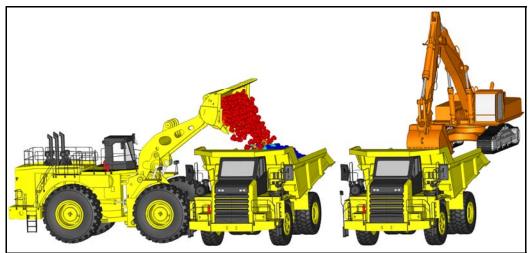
Loading Configurations - Loader/Truck (Left) and Excavator/Truck(Right)
